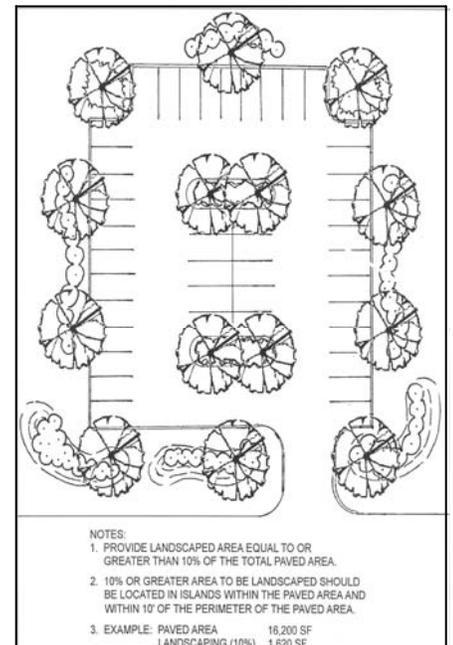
Provide Parking Lot Planting to Reduce Heat Gain
